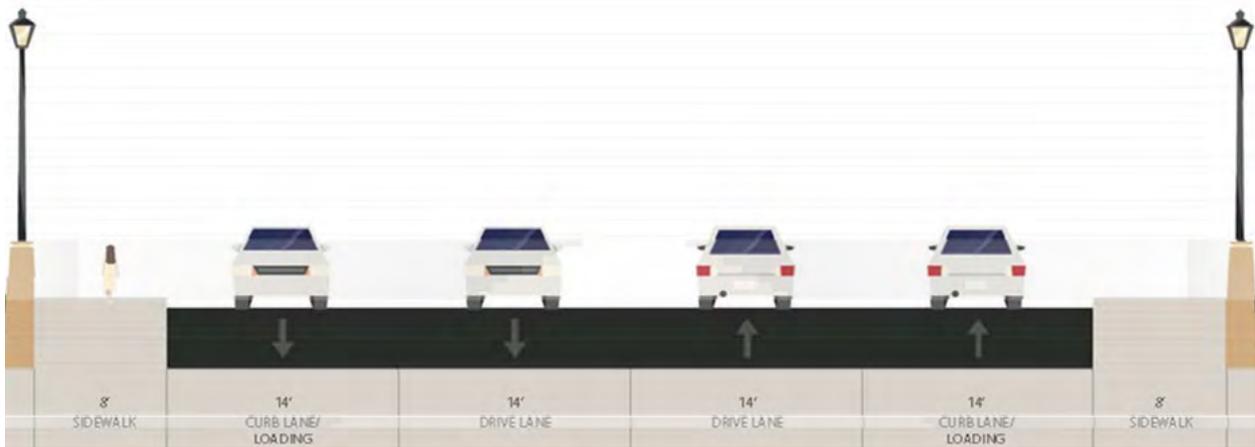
EXISTING SECTION OF ELM STREET BRIDGE
